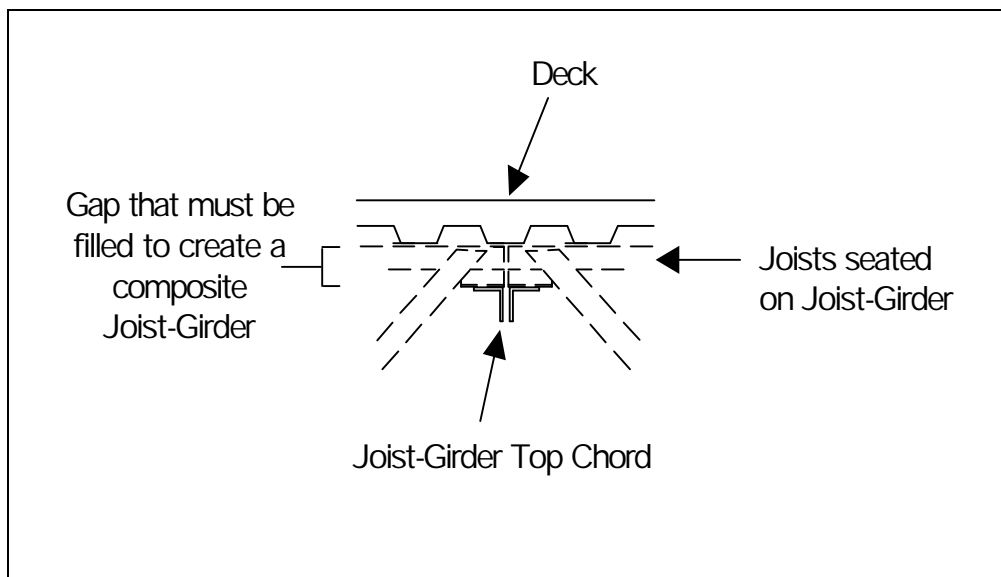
Depiction of Gap Between Slab and Joist-Girder
